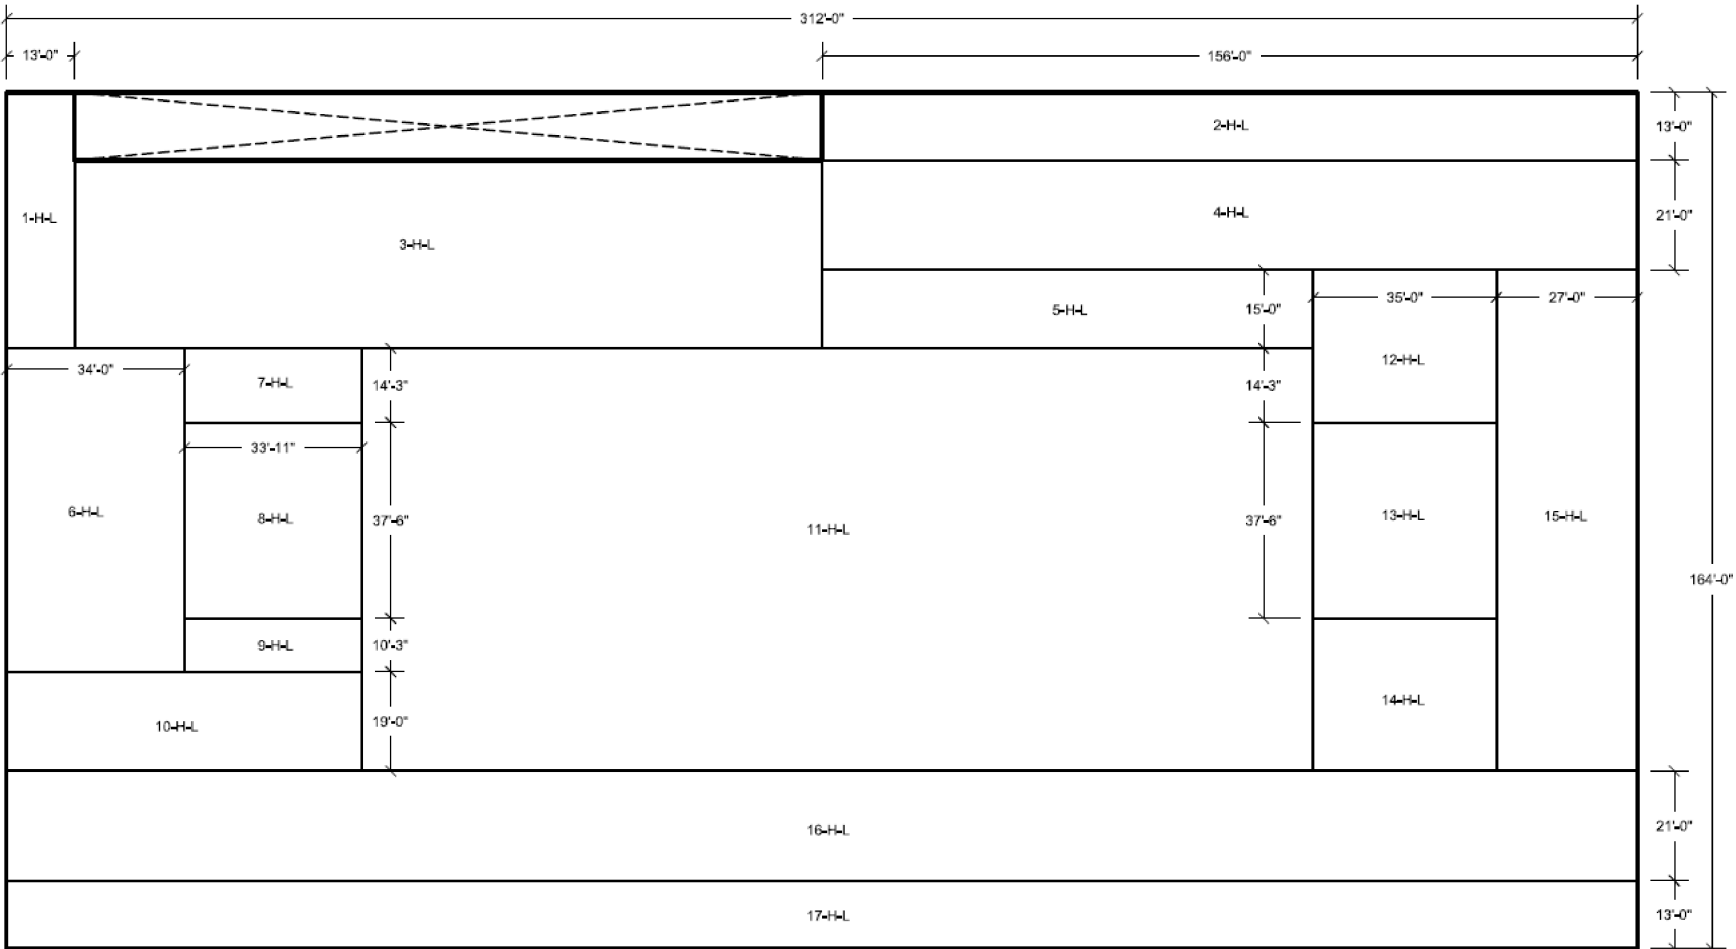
H.6-133 UHS Basin Foundation Mat East/West Reinforcement Zones Bottom Face
